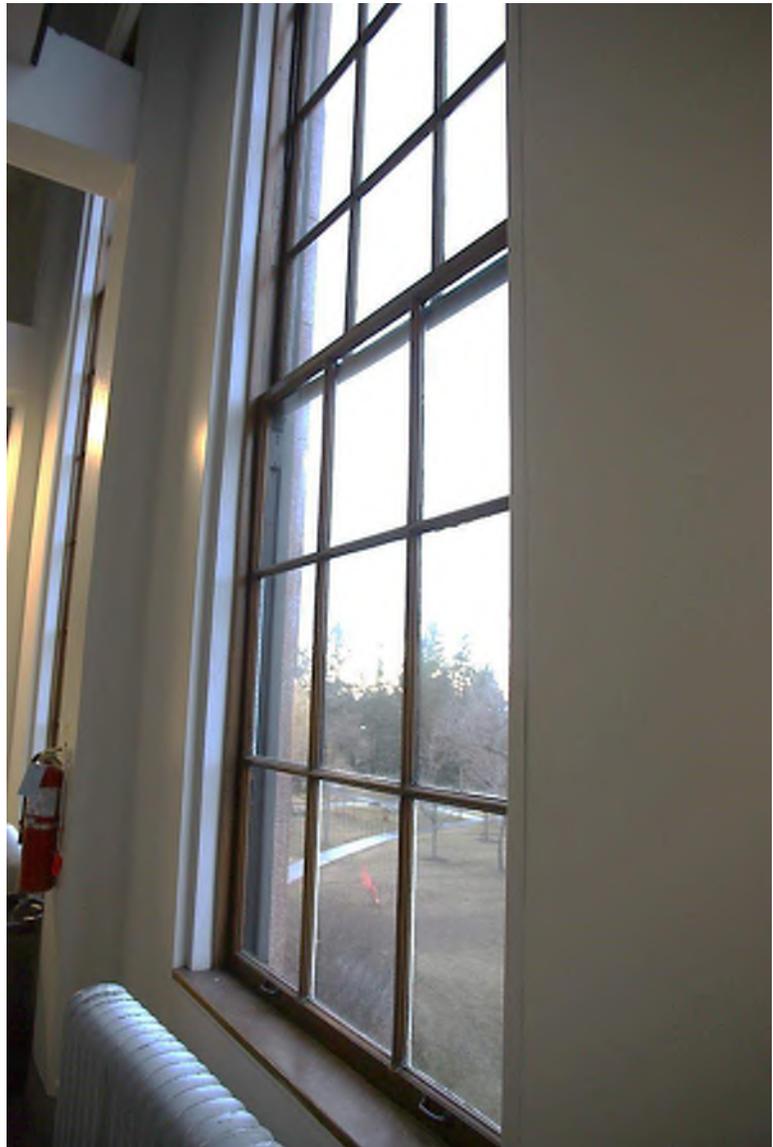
A gap at the meeting rail of the two-story window of the north stair hall.
